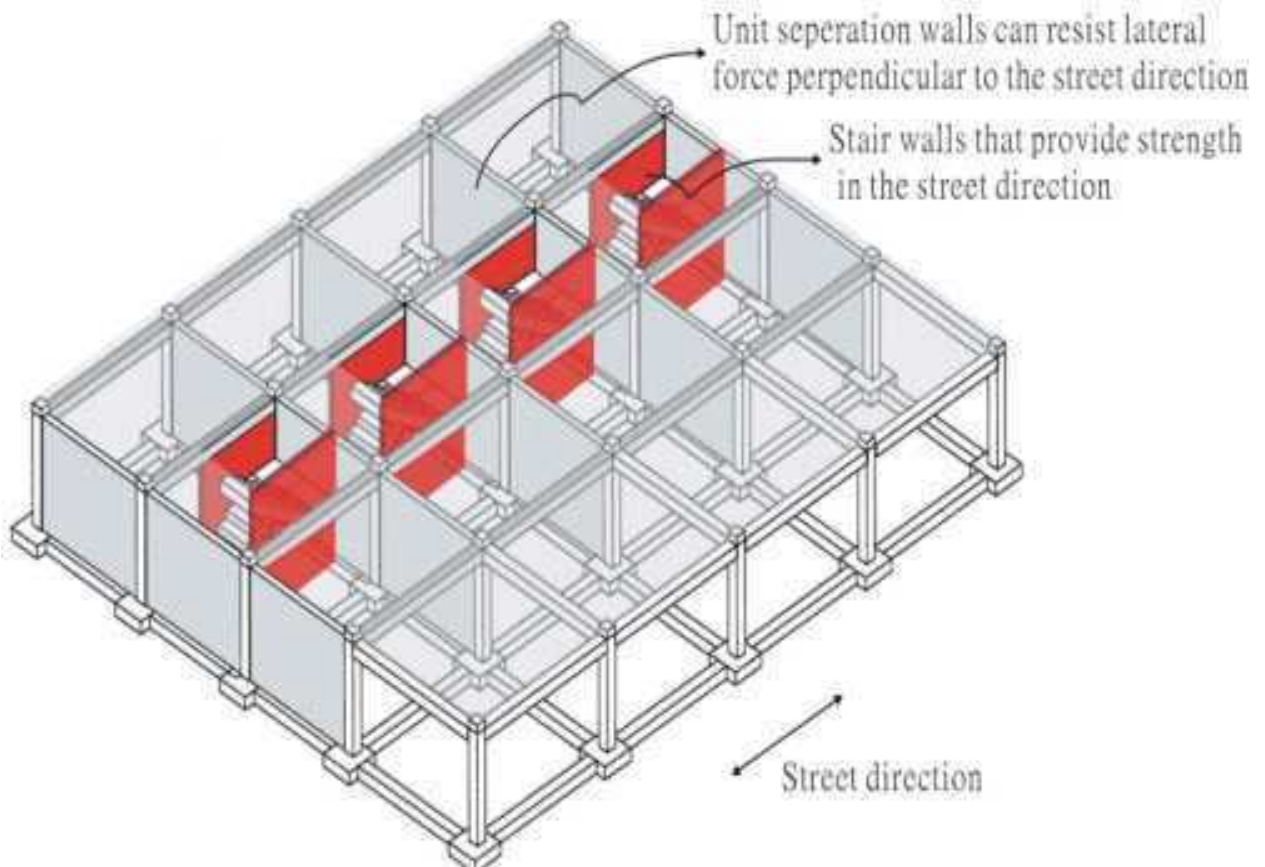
B: Key Loadbearing Elements - Wall Layout in the Street Direction
